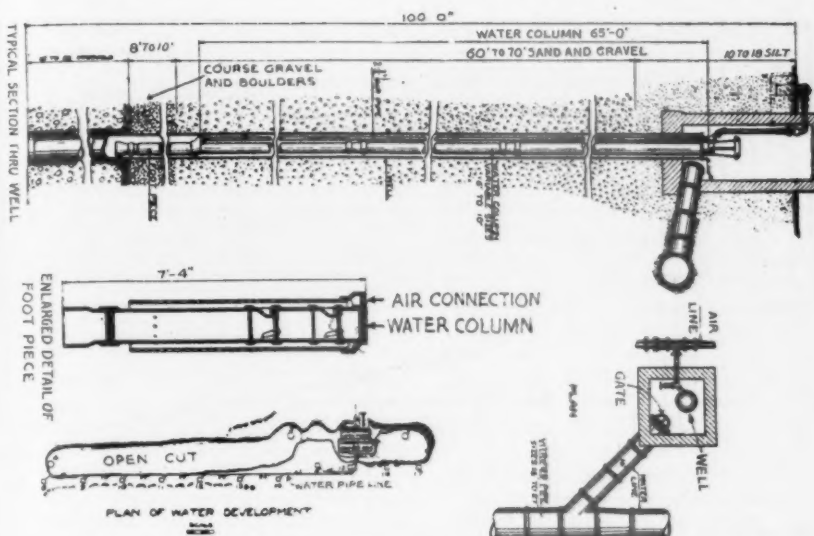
Typical well installation of air lift water system. Also plan of air lift water development. Construction completed in 1919
